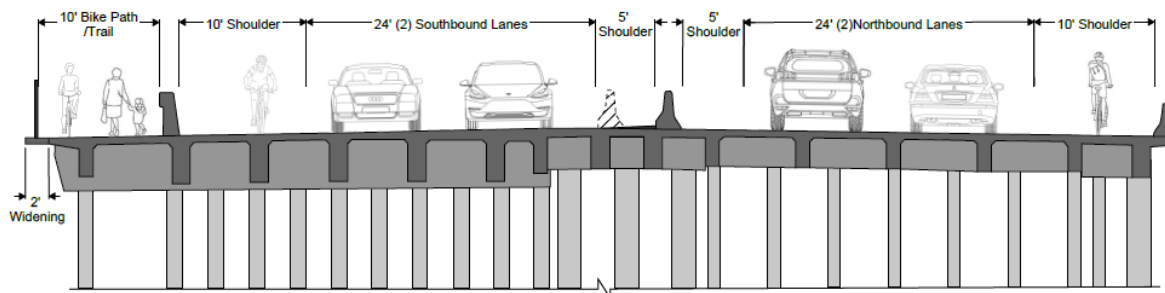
Conceptual Overview of Little River Bridge Design Approach
